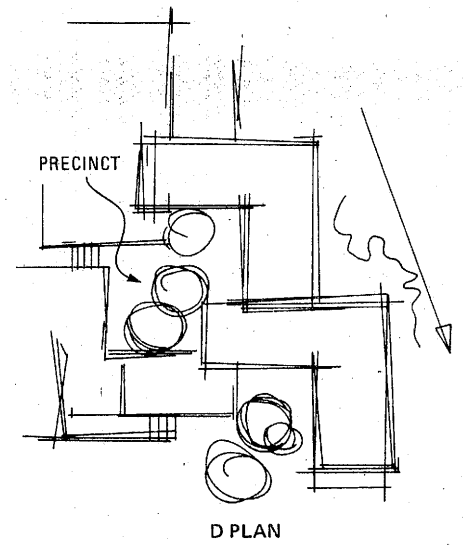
Sketch of classroom layout and surroundings (image from Schön (1983))
